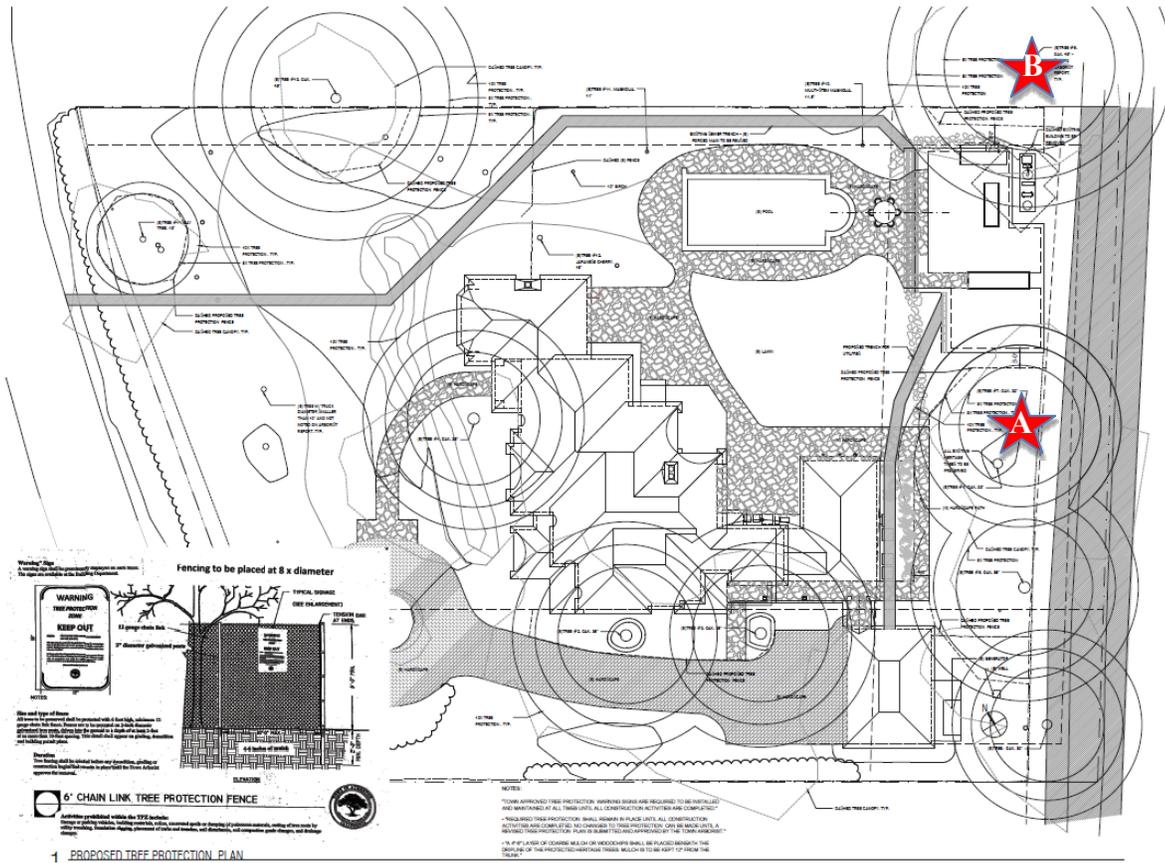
Proposed Project, Tree Protection Impact for ADU, compared to existing Pool House
